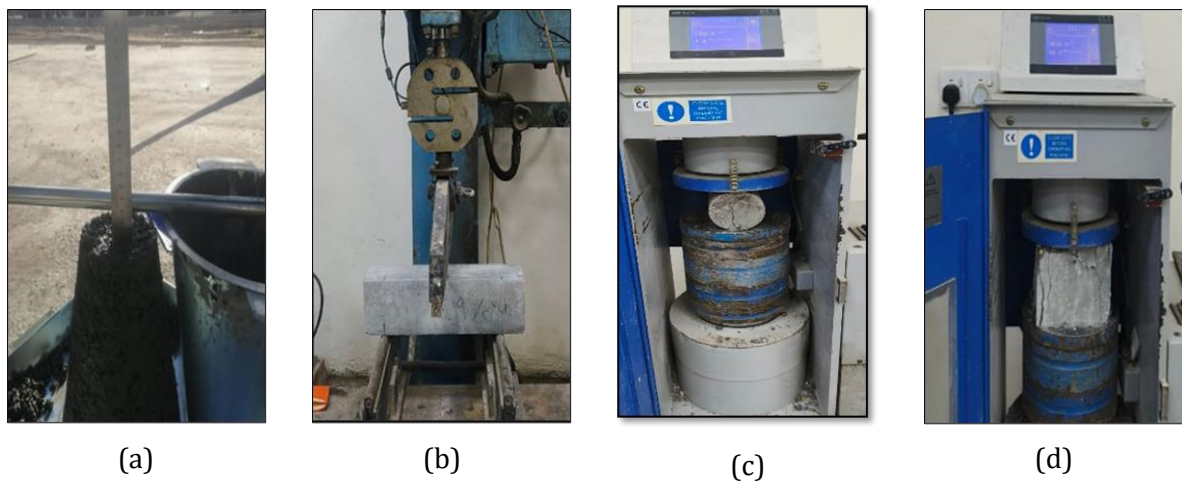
Fresh and hardened concrete test (a) slump test, (b) modules of rupture test, (c) splitting tensile strength test, and(d) compressive strength test
